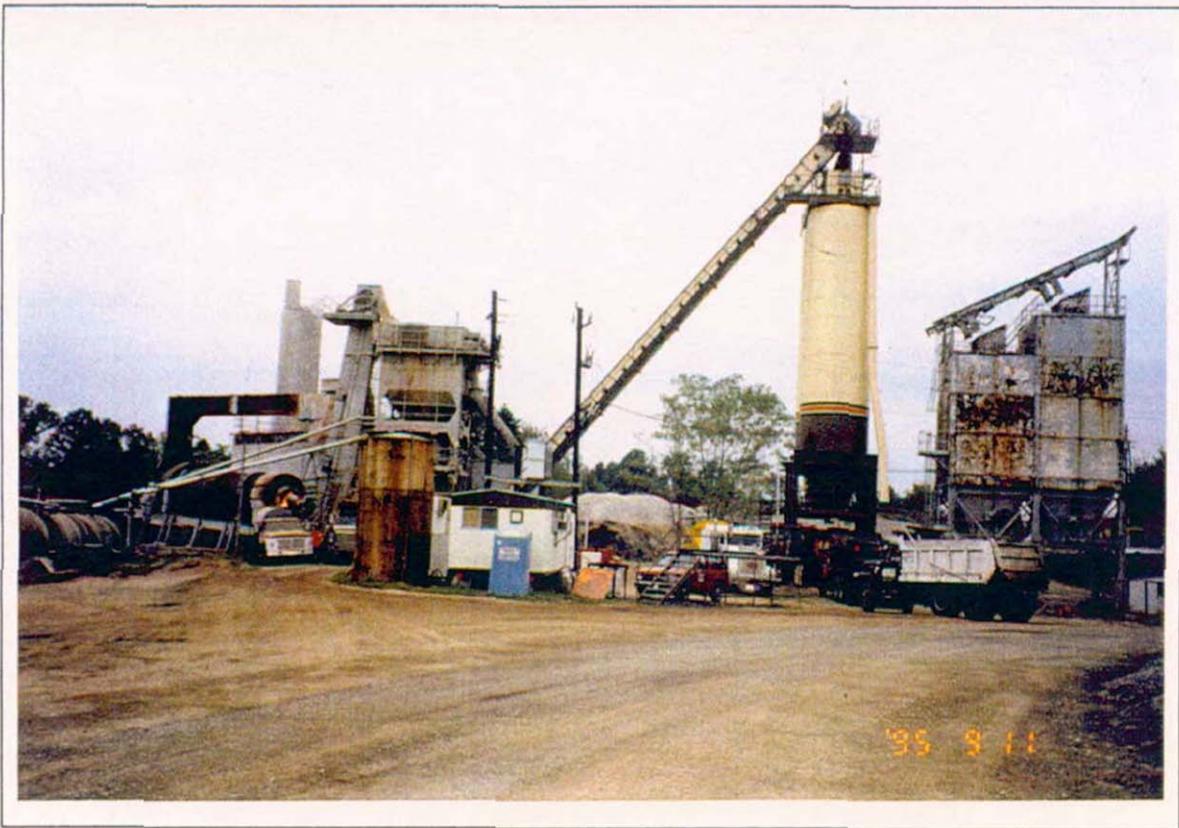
APAC ASTEC Two Silo Batch Asphalt Plant Located at Shelton North Carolina, September 11, 1995
